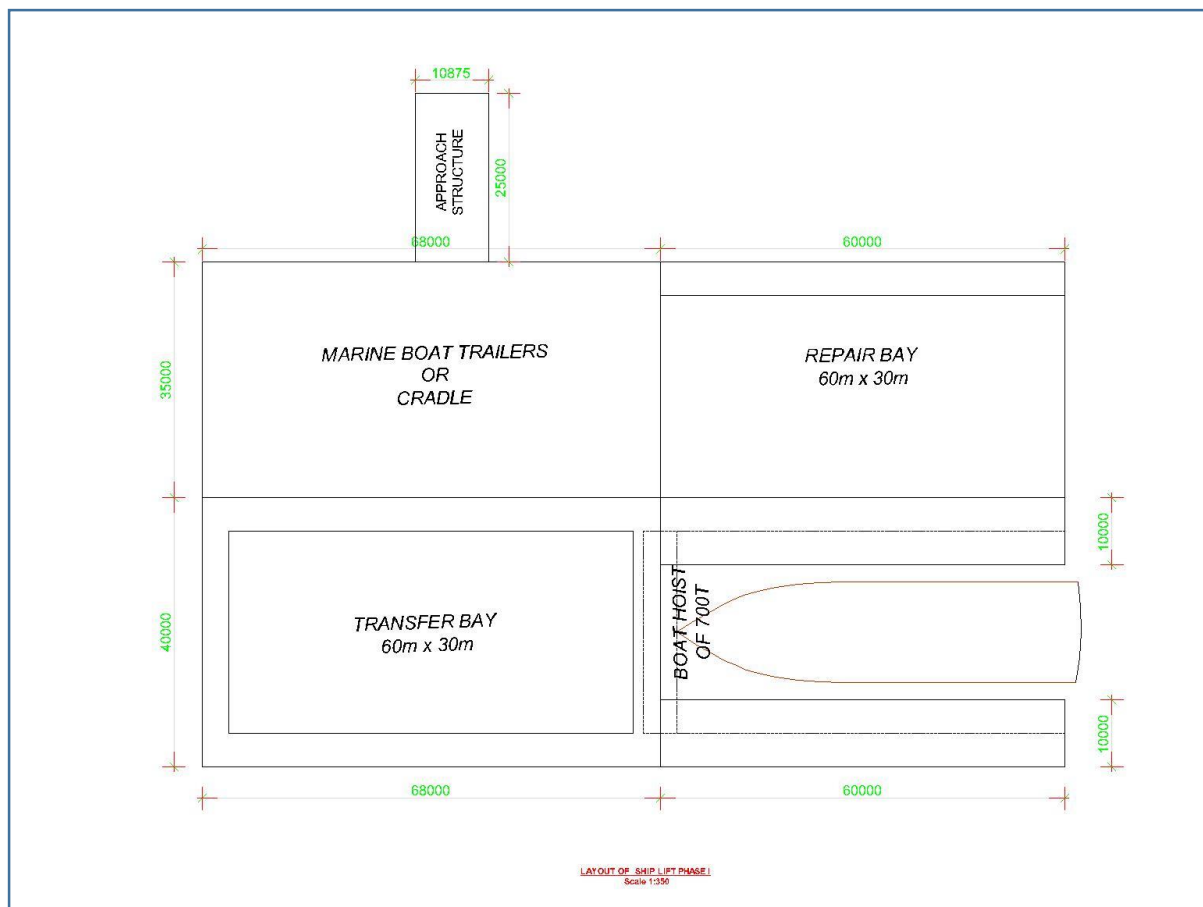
1 Proposed Layout of Ship Repair Facility in Varanasi
